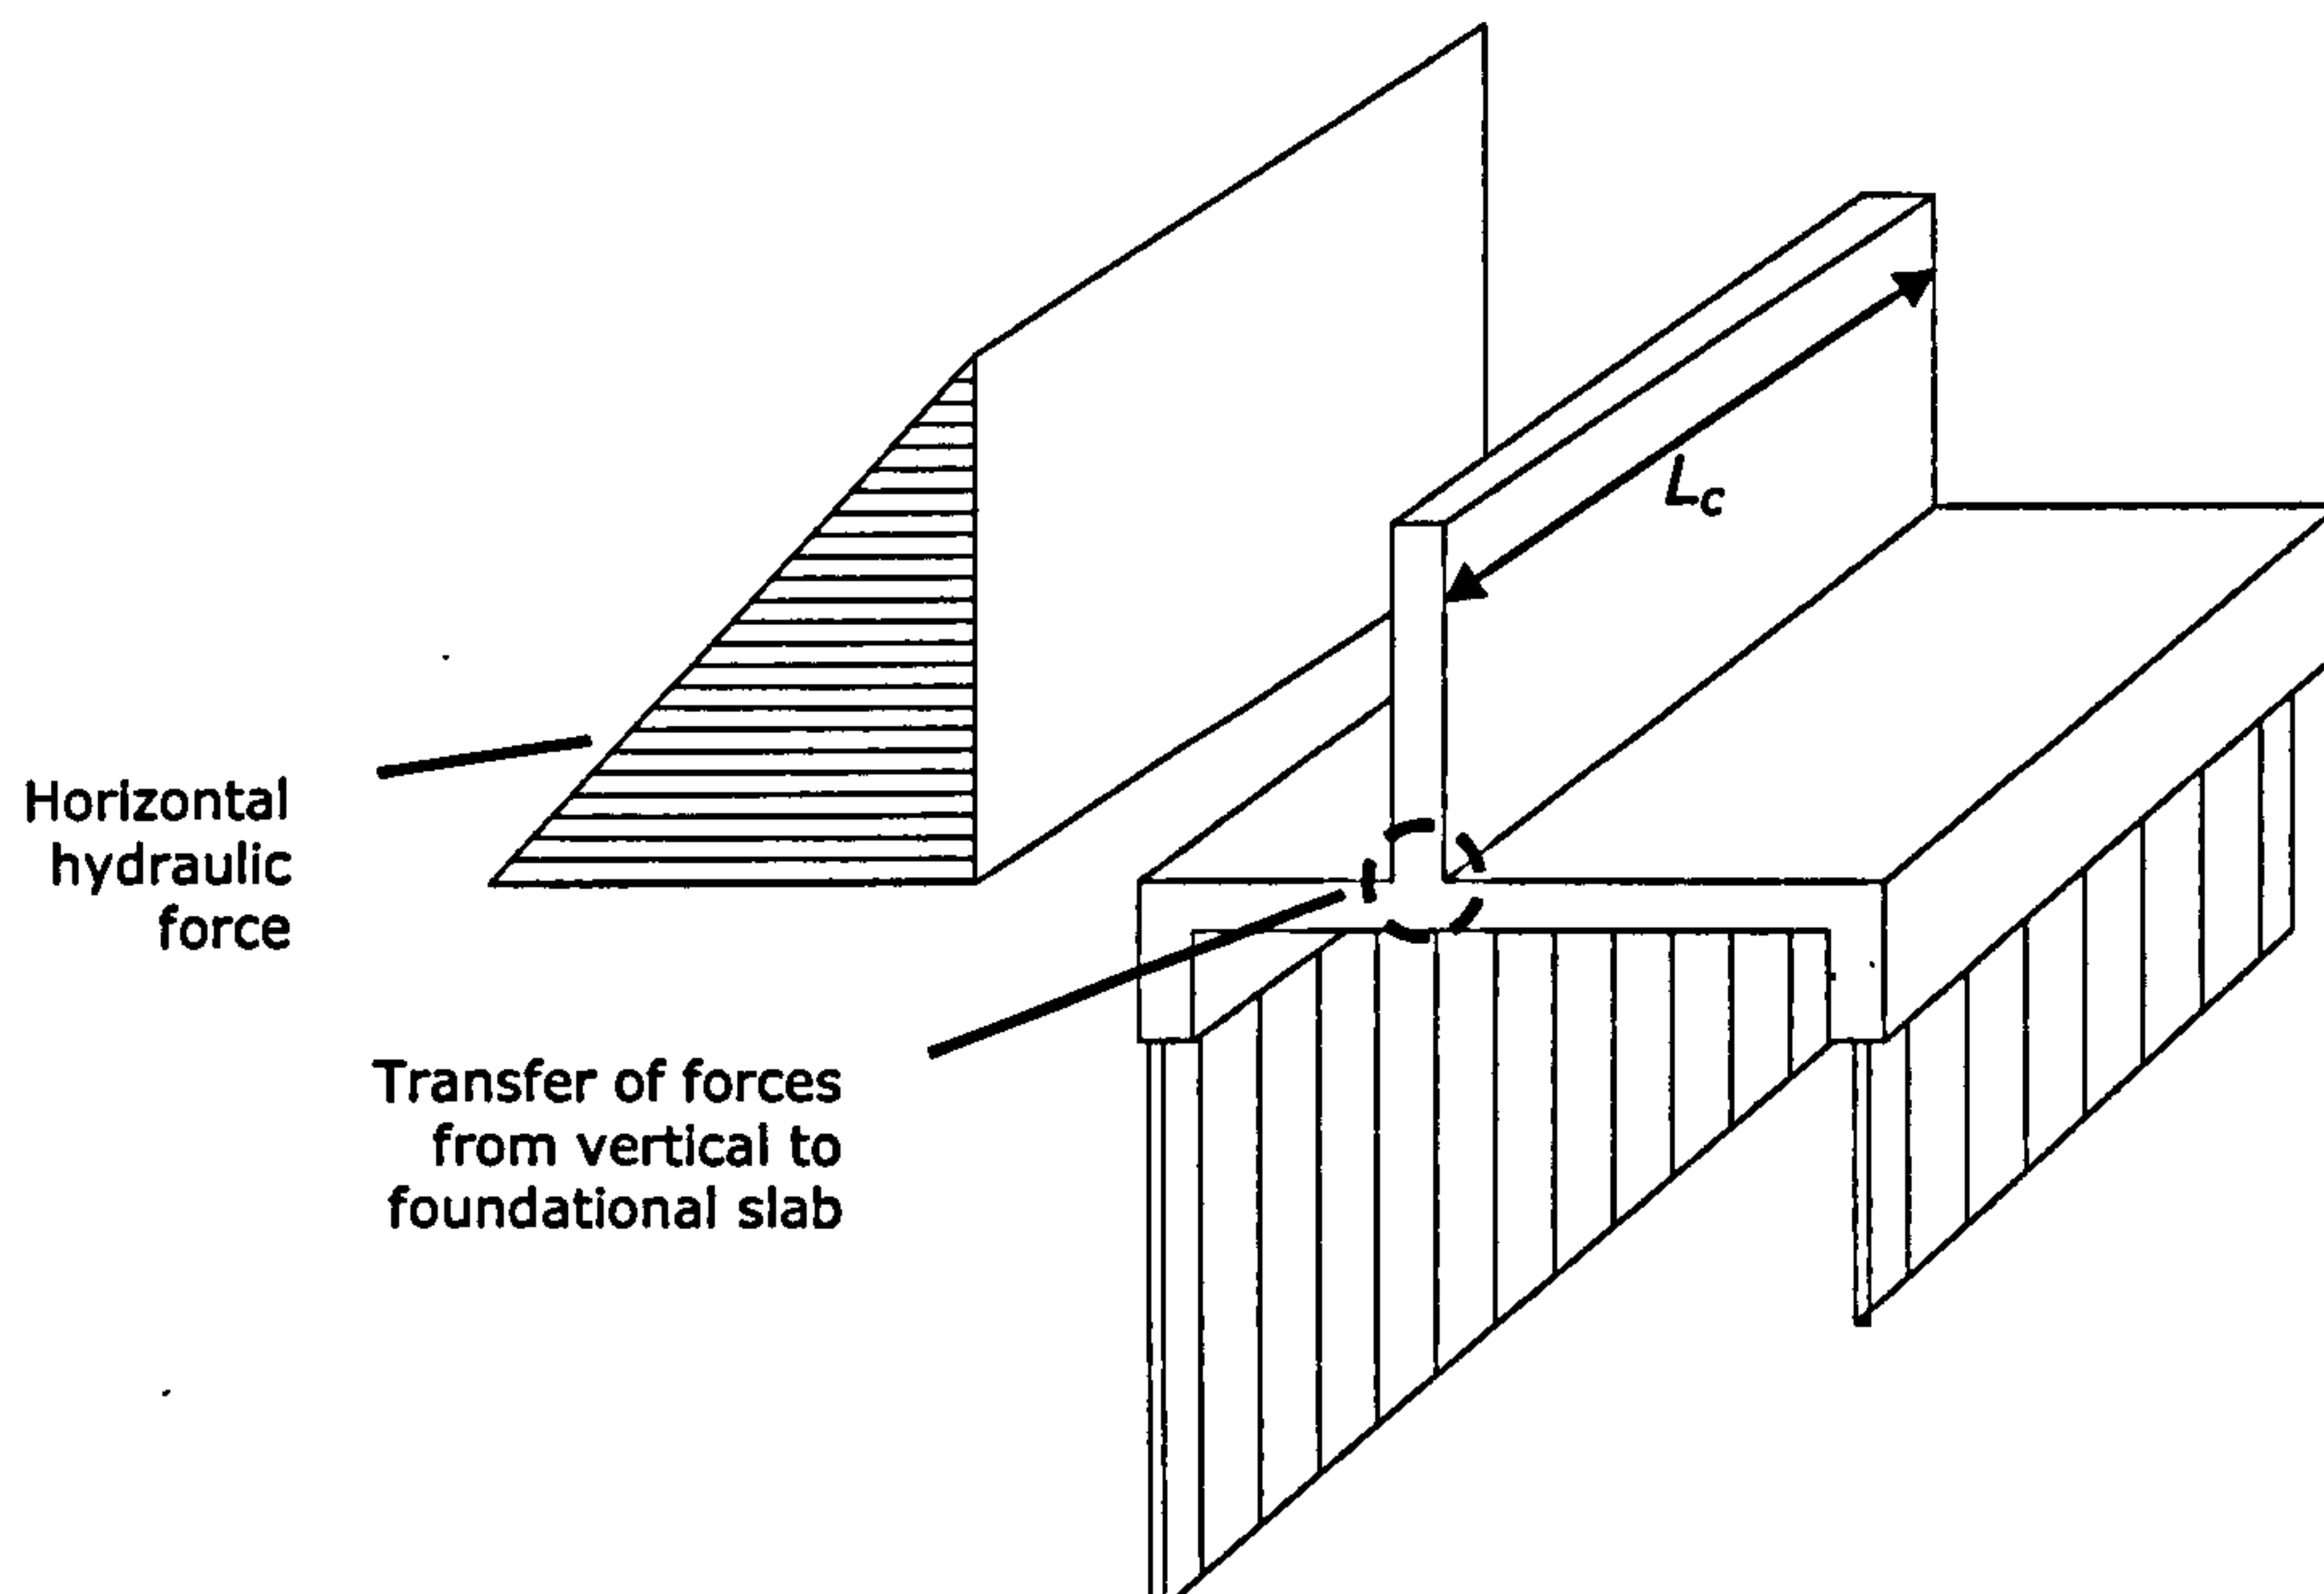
One unit of concrete wall structure indicating location of transfer of forces between vertical slab to foundational concrete slab.
